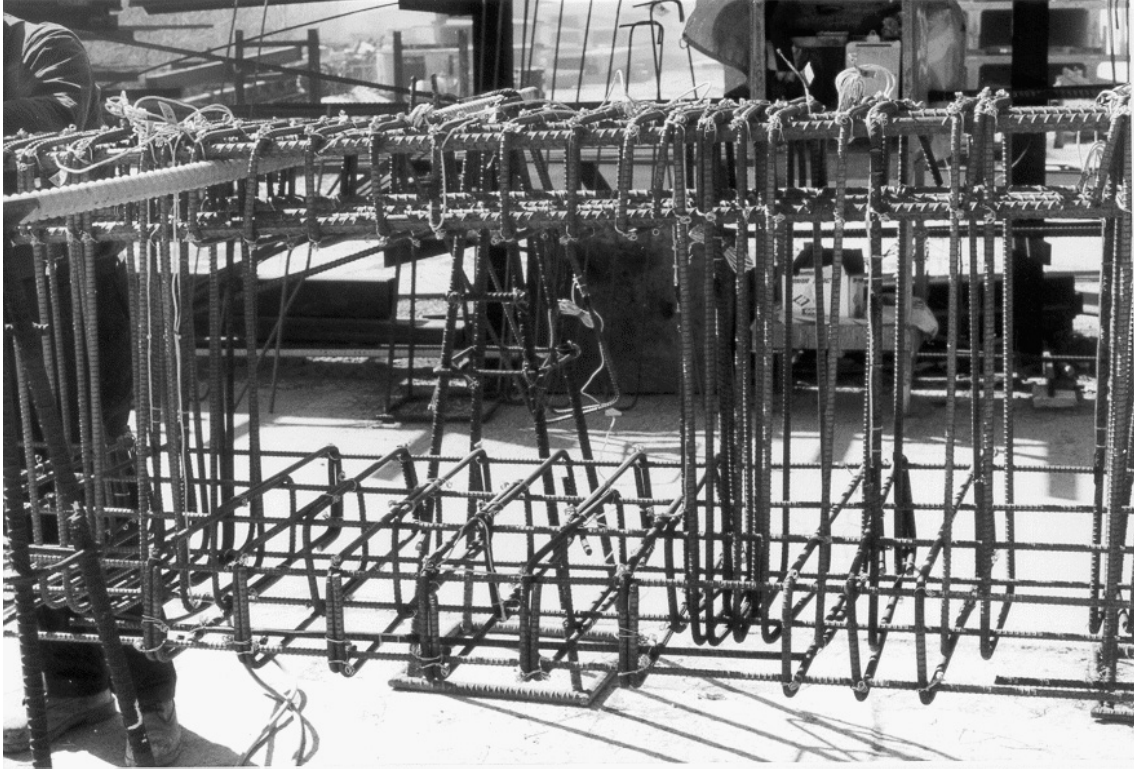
Reinforcement cage in fabrication showing instrumented bars, S1, opening 1
